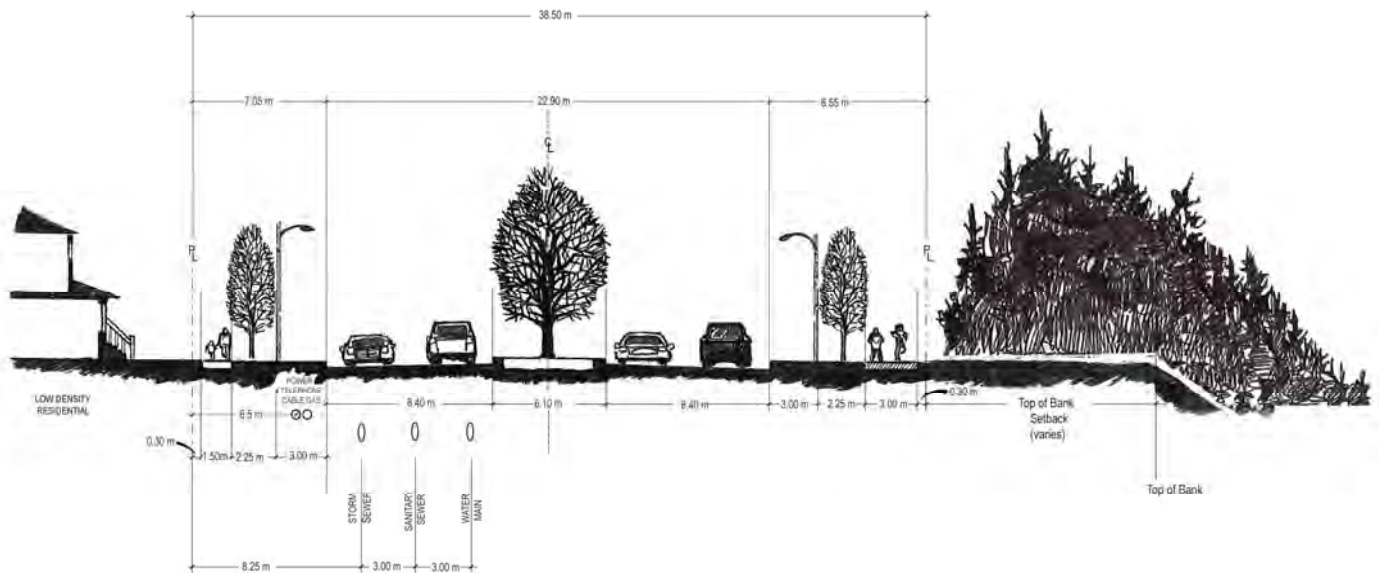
Cross section of Saline Creek Parkway within Area Plan
